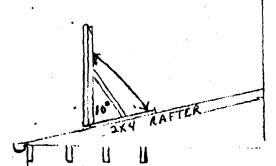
DETAIL MOUNTING OF HAND CARVED WOOD SIZN
